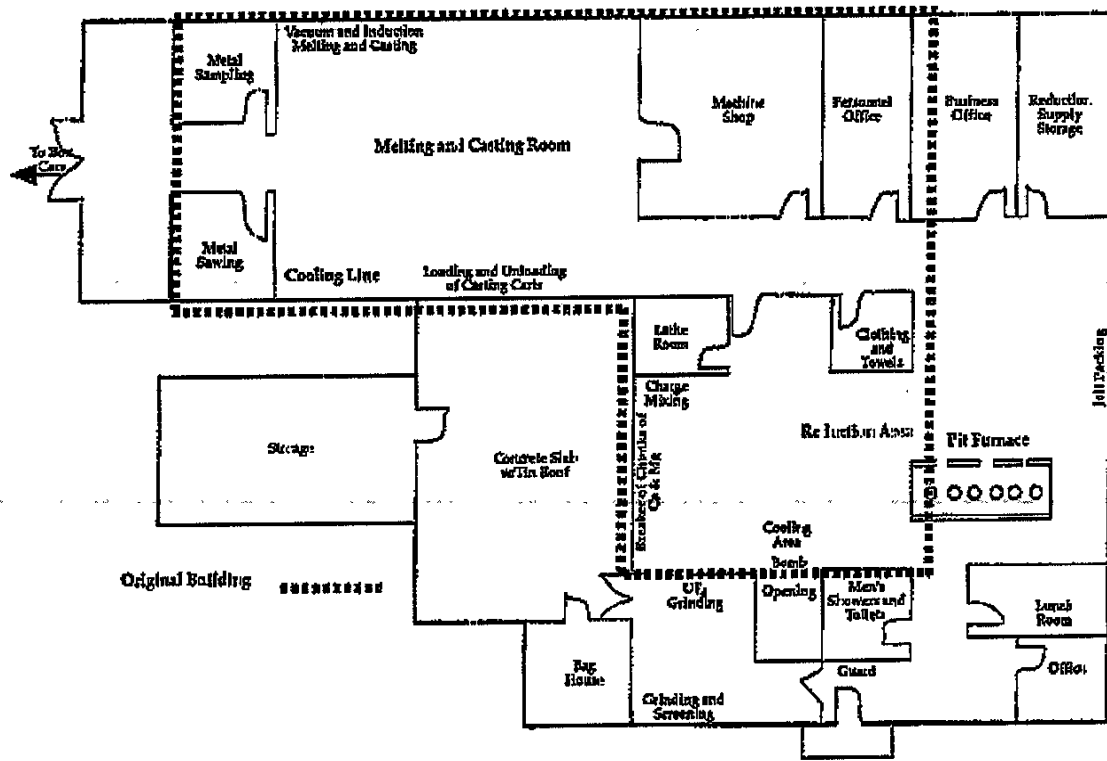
Floor plan of Little Ankeny production facility for uranium and thorium.
